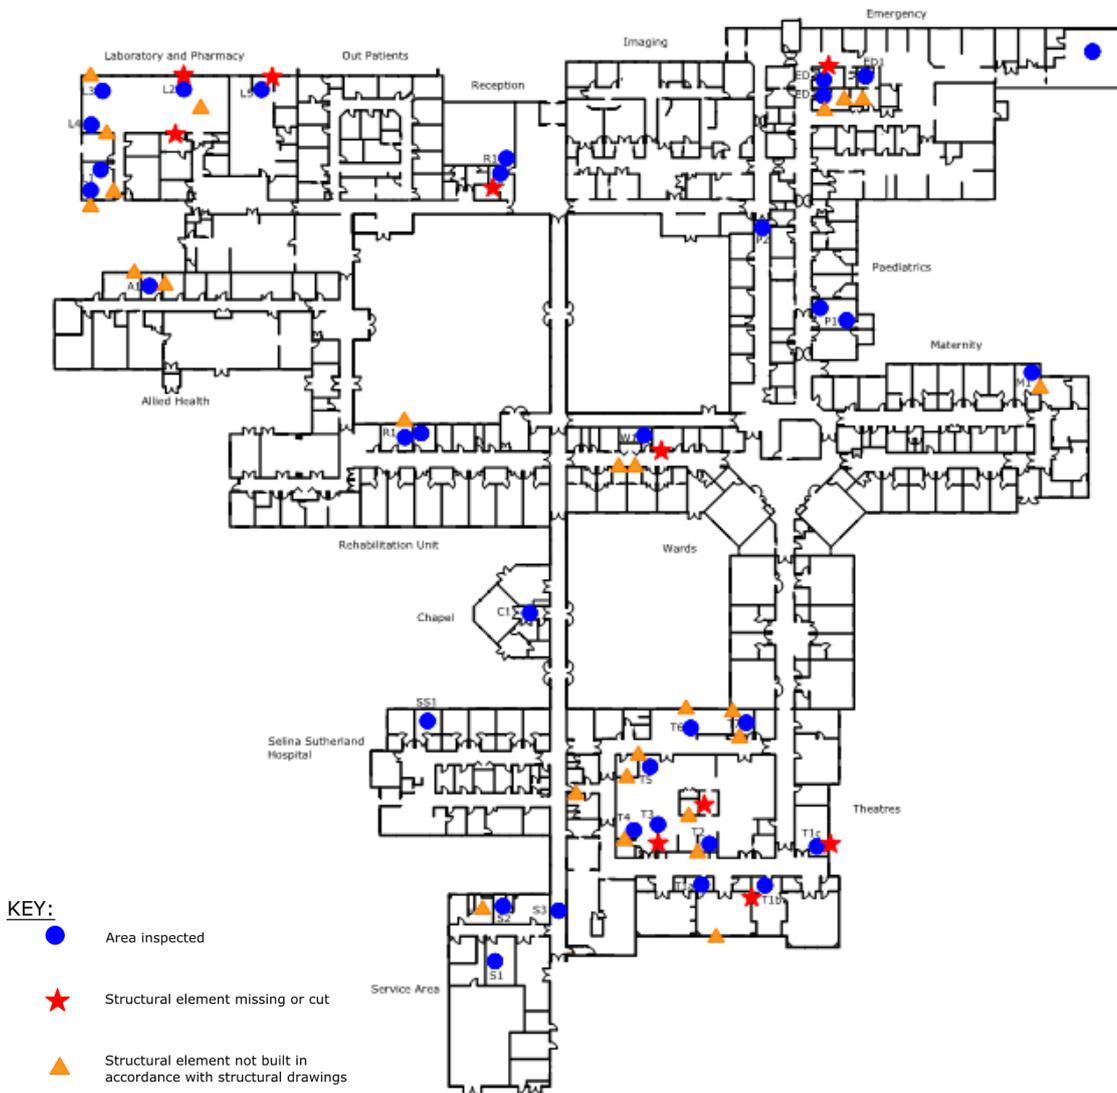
Floor plan indicating areas inspected, inspections were in roof spaces and focused on roof space bracing, ceiling plane strap bracing and part ply ceiling diaphragm sections.
